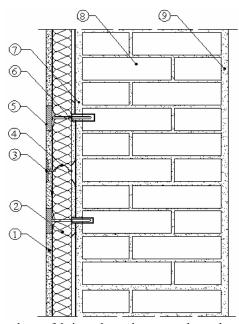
Setting the prefabricated two-layer panels on the masonry walls:
